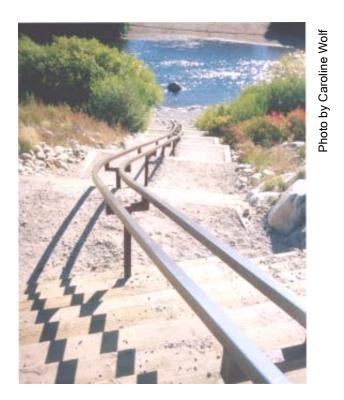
A: Timber stairs and metal boat slide facilitate access from a steep bank
